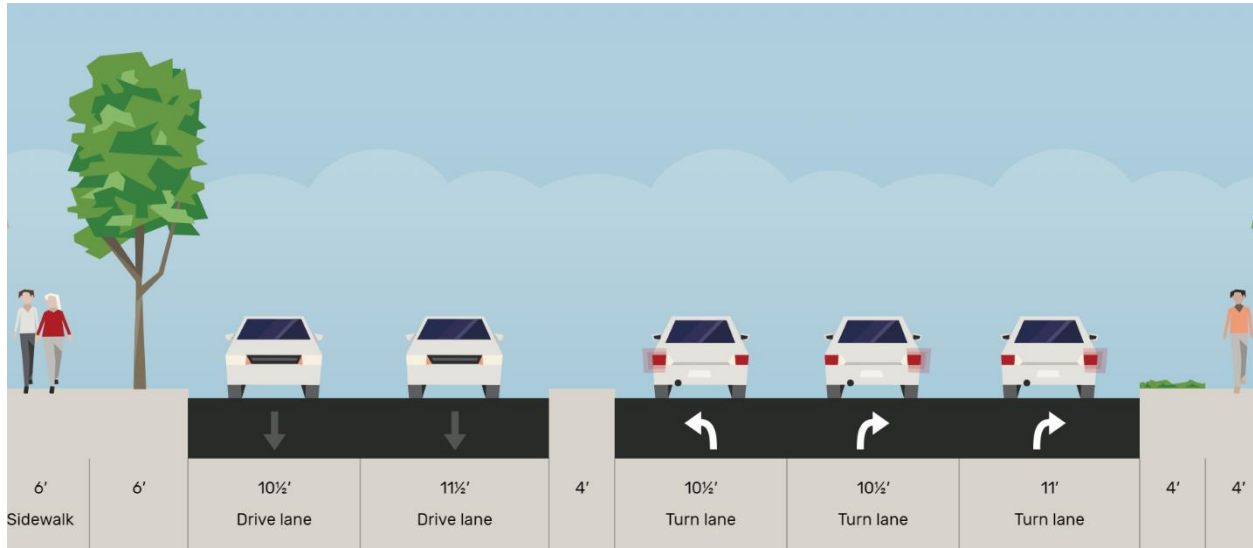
EXISTING HOLLAND LANE CROSS-SECTION FROM JAMIESON AVENUE TO DUKE STREET
